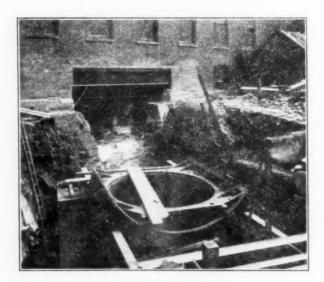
View of Saddle for Draft Tube and Opening for Main Feeder Waterwheel at Merrimack Manufacturing Company
